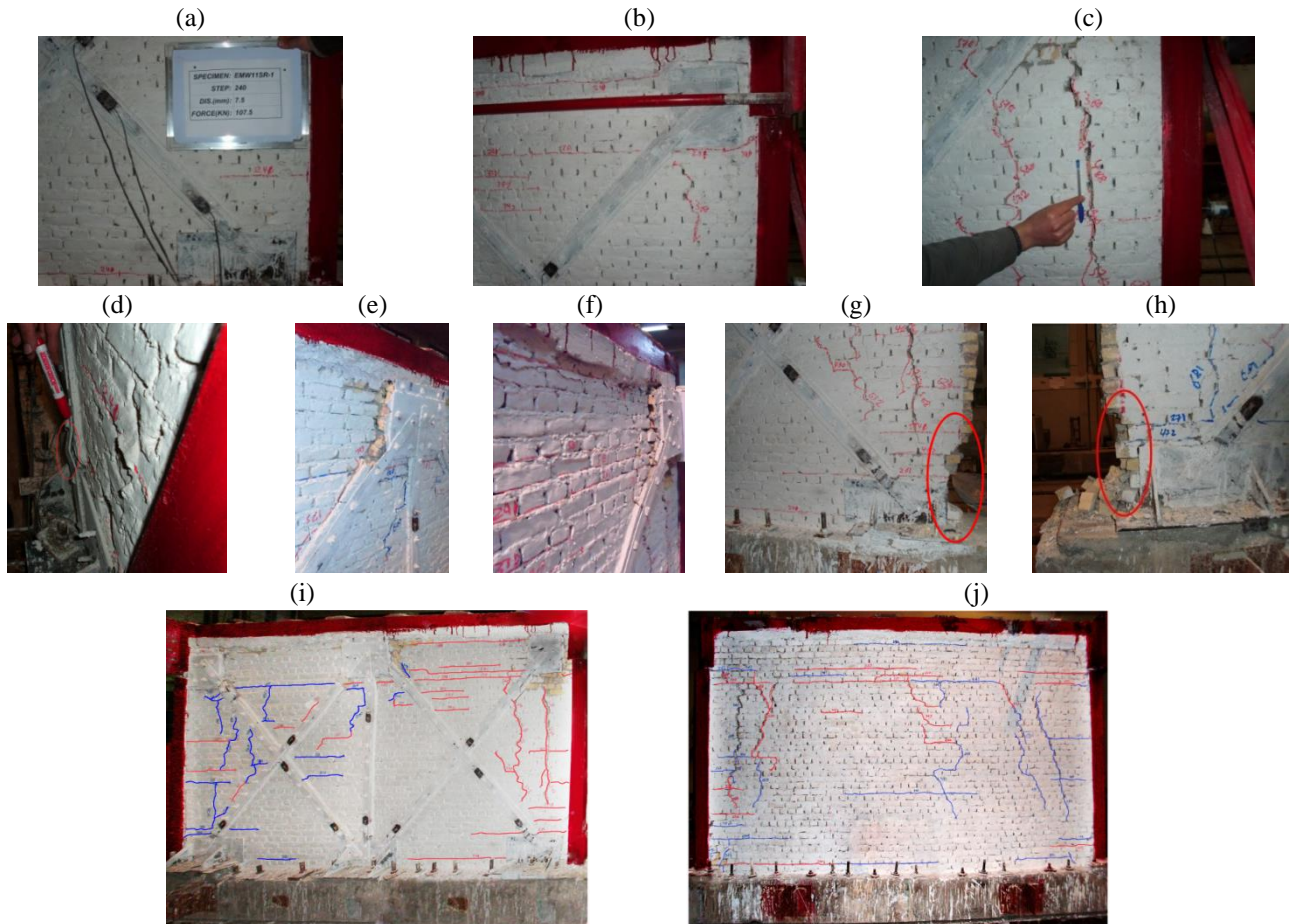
Damage and crack patterns of Specimen EMW11SR-3 (a) Horizontal crack, (b) Vertical crack, (c) Width of vertical crack, (d) local buckling of steel strip, (e) and (f) separation of the steel plates from the specimen, (g) and (h) toe crushing, (i) Retrofitted surface end of test and (j) Unretrofitted surface end of test
